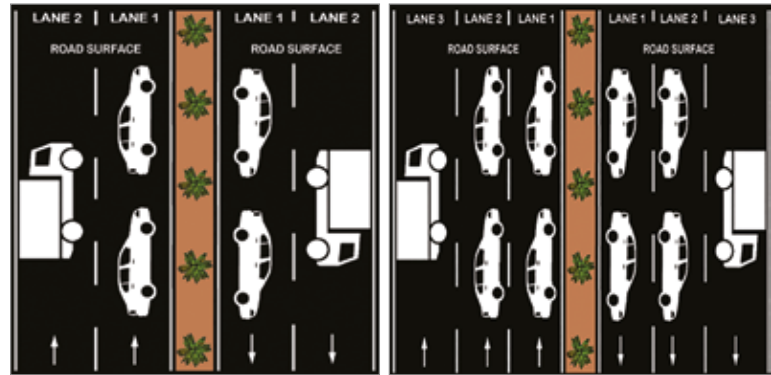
A & 6B: Road Surface of Highway with Pictorial Depiction on Road Surface (Source: Author)
